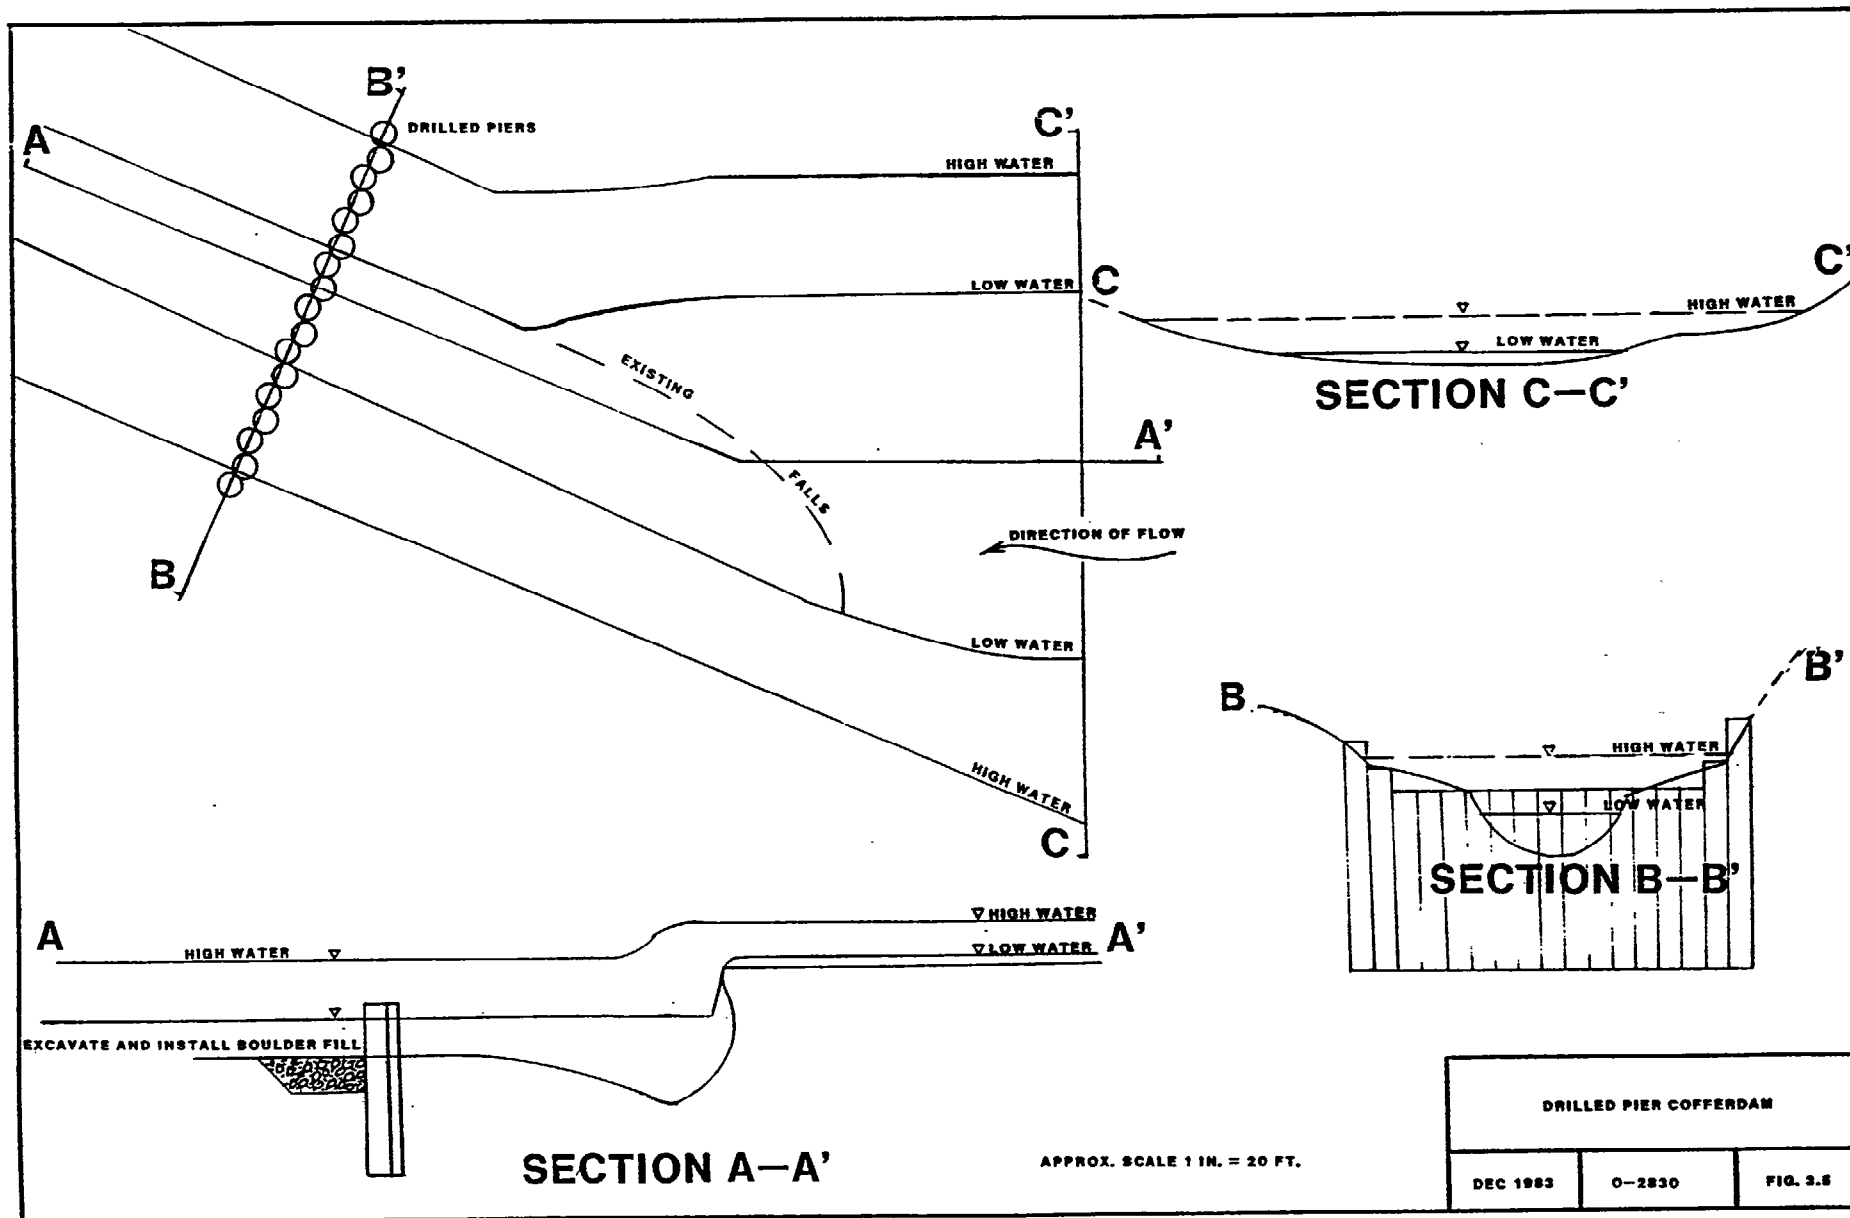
illustrates the installation of drilled piers downstream from the waterfall. The piers could be made virtually any diameter (smaller piers may require three or four rows for sufficient strength in bending). Piers would be grouted by tremie methods below the creek bottom and formed above. A boulder or paved downstream blanket is provided to prevent scour at the toe. If the cofferdam is sufficiently high, the upstream pool will back water above the falls, and the existing scour hole will backfill naturally. Alternatively a low cofferdam would require complete backfill as shown on Figure 3.1 (Gabion Check Dam).
